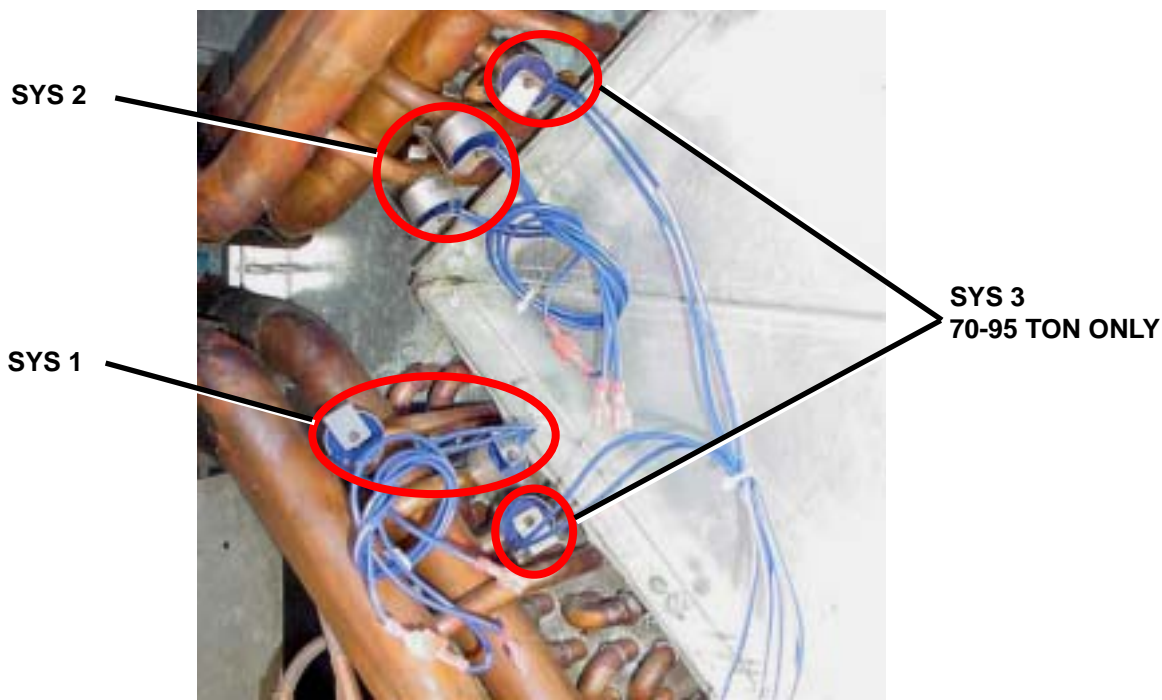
FREEZESTAT MOUNTING AND WIRING ON COIL HEADER
